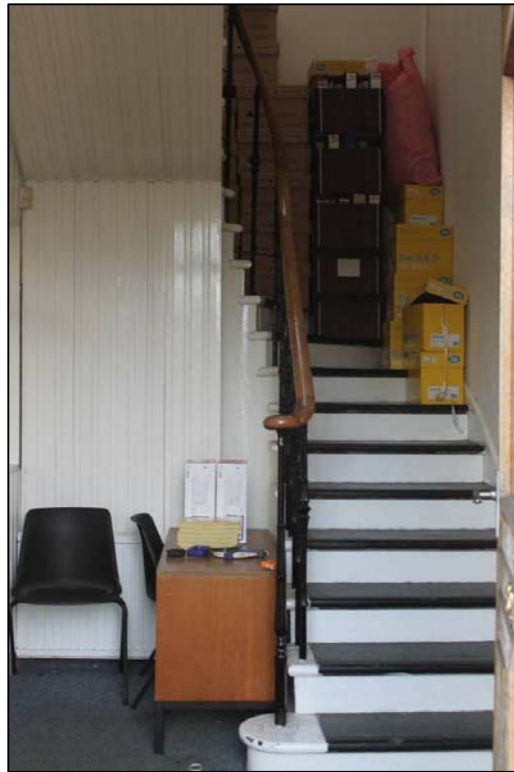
Stairway/hallway (ground floor), staircase and N wall taken from S.
